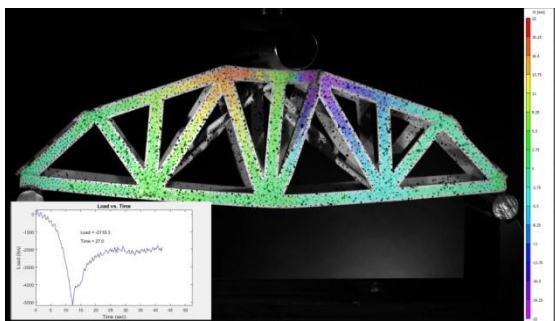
Out of plane measurement capabilities demonstrated on a Truss System under load
